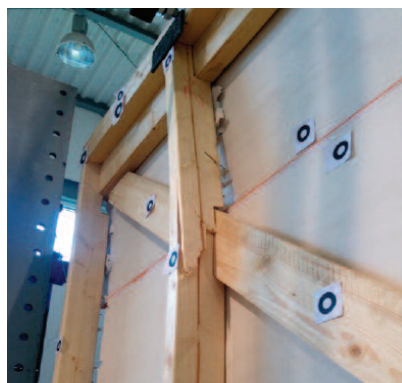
Detail of the destruction of the 90zb wall – separation of the cladding and a destroyed post
